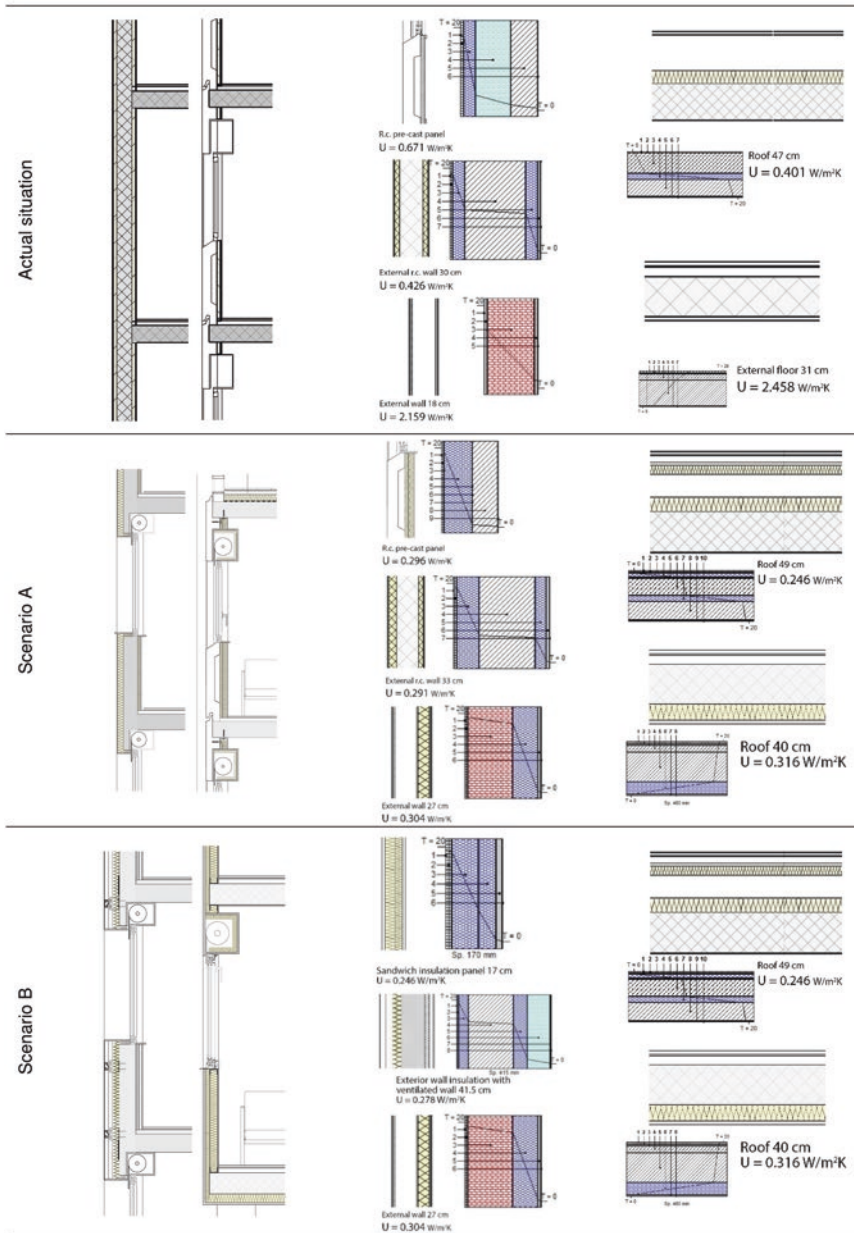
Scenario comparison: façade sections (left) and details (centre); roofs and external floors (right)
